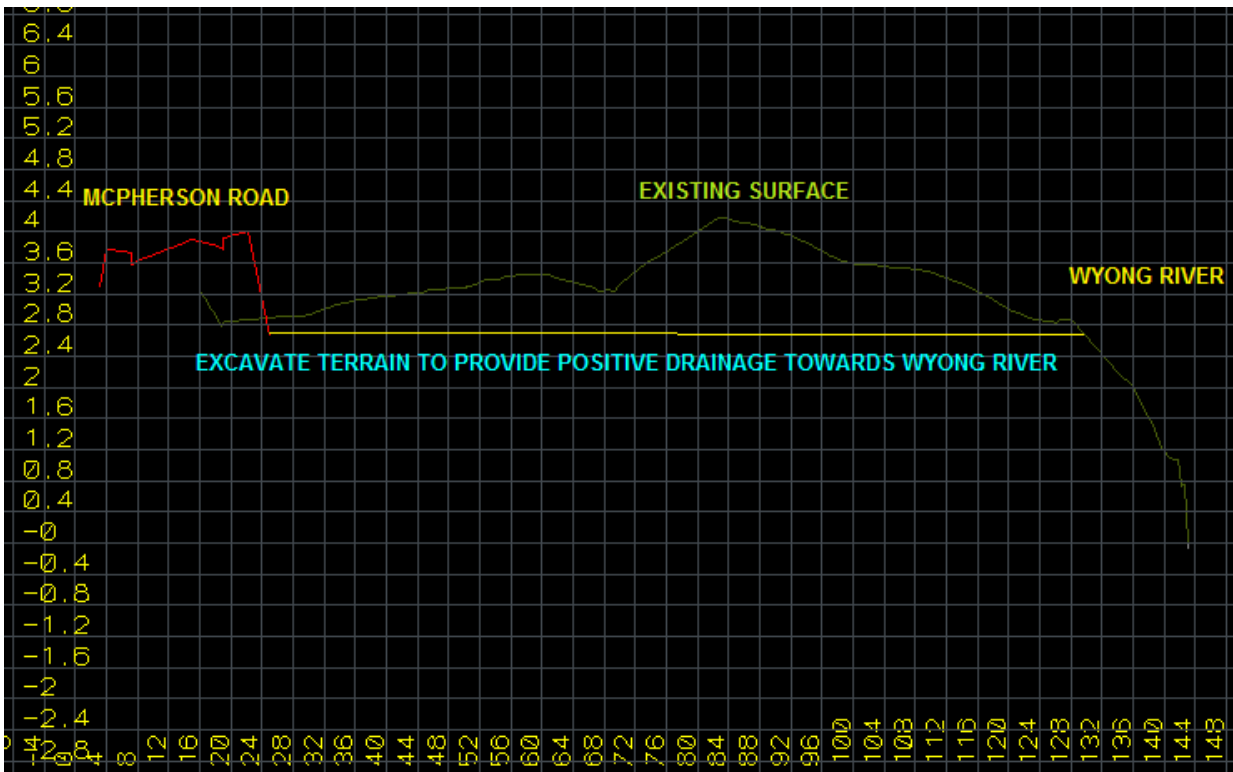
Typical Section of Proposed Excavation at 204-206 and 210 Pacific Highway, Tuggerah
